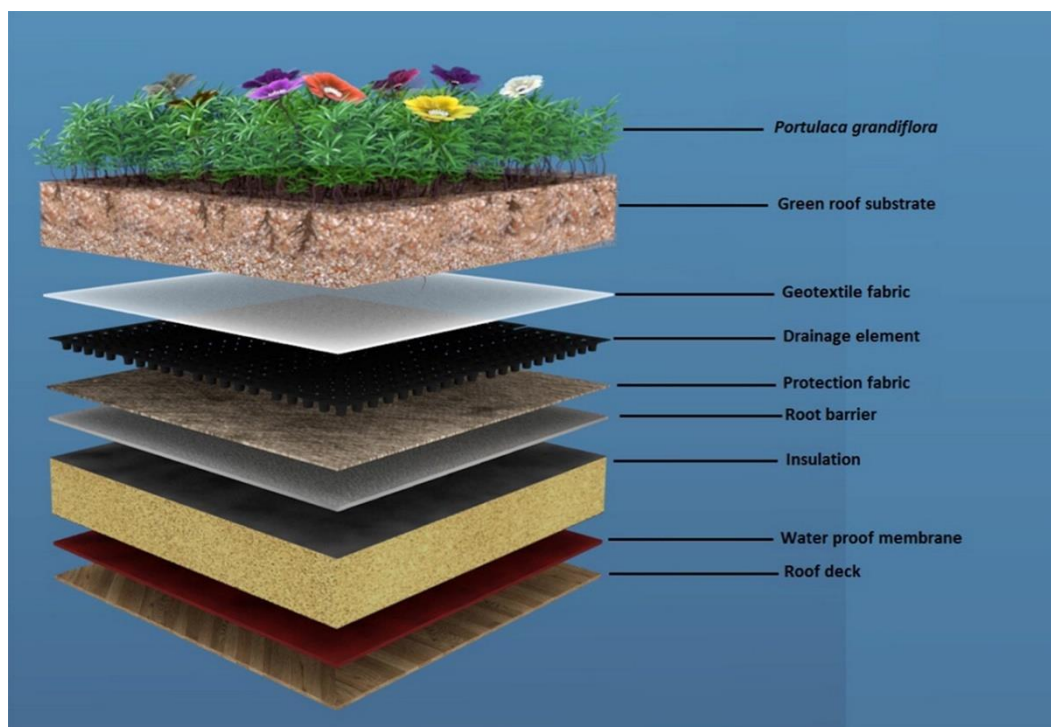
CONFIGURATION OF A GREEN ROOF (VIJAYARAGHAVAN AND RAJA, 2014)
